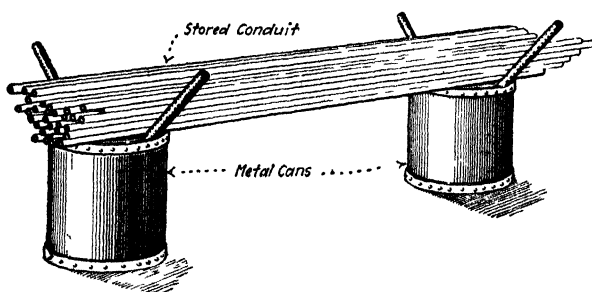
An improvised pipe rack; wooden barrels or boxes may be used instead of the metal cans.
